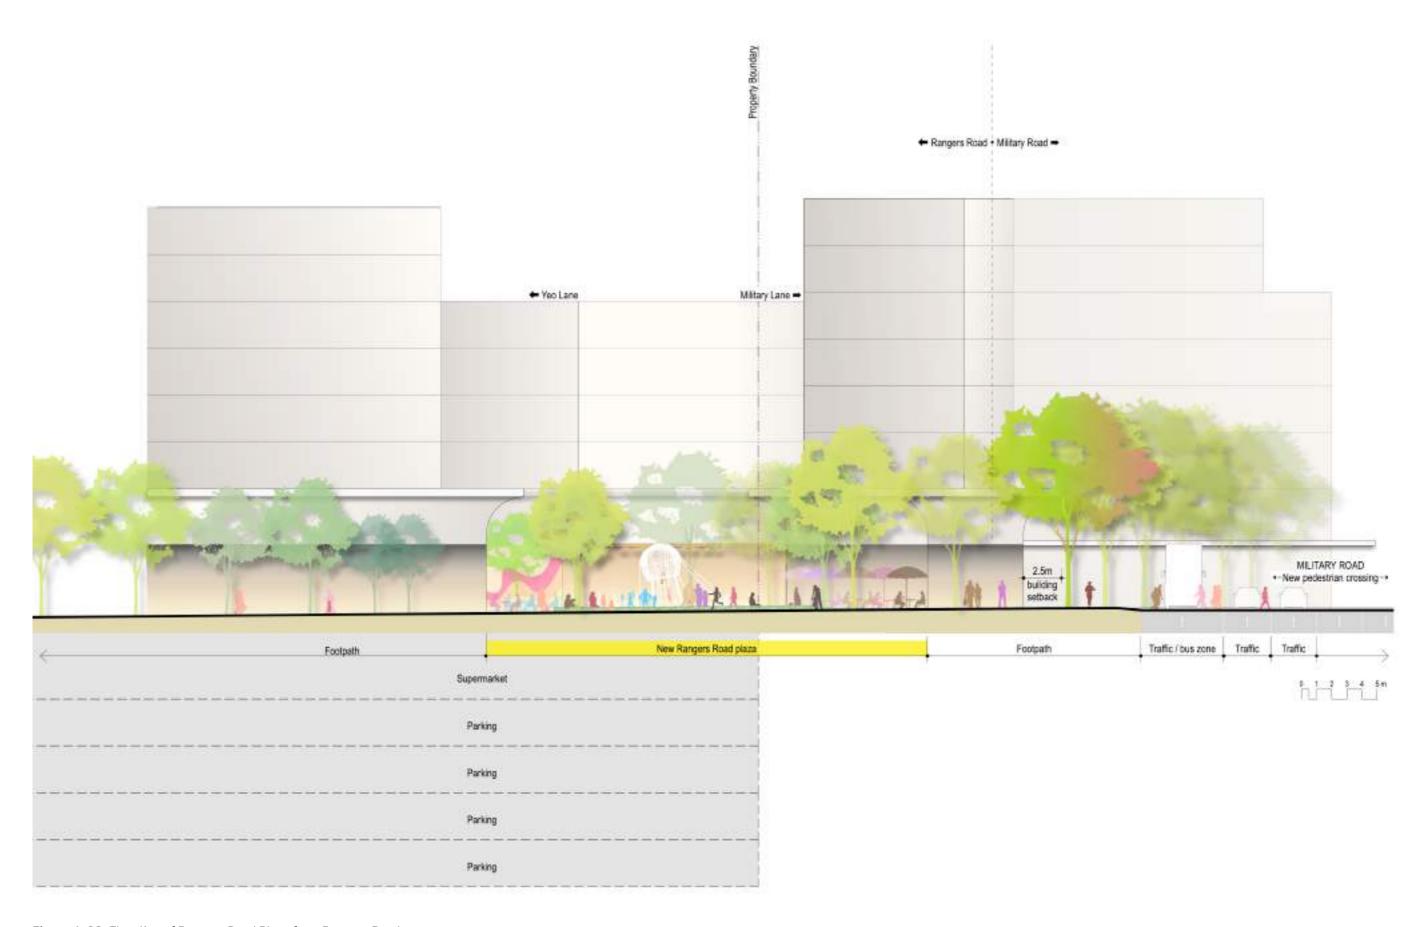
Elevation of Rangers Road Plaza from Rangers Road
